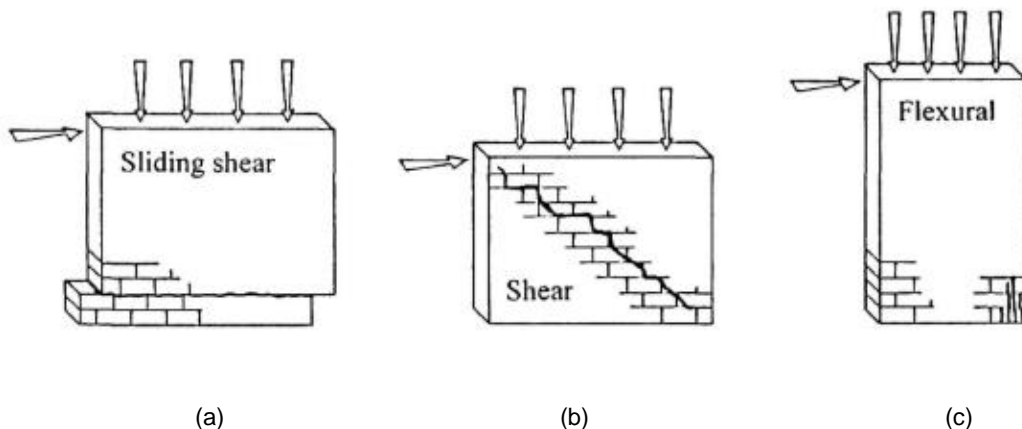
typical failure modes of masonry subjected to in plane forces (Tomažević, 1999).
